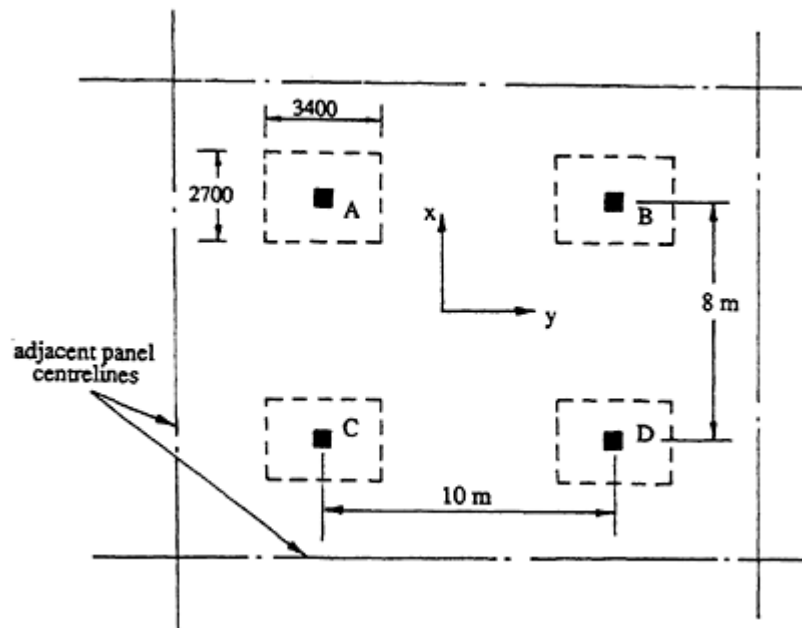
Plan of flat slab of [Example 11.4](#).
